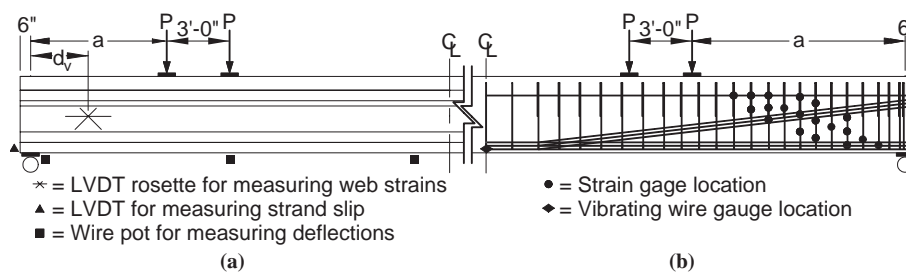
Instrumentation on (a) the concrete surface and (b) the reinforcement.
